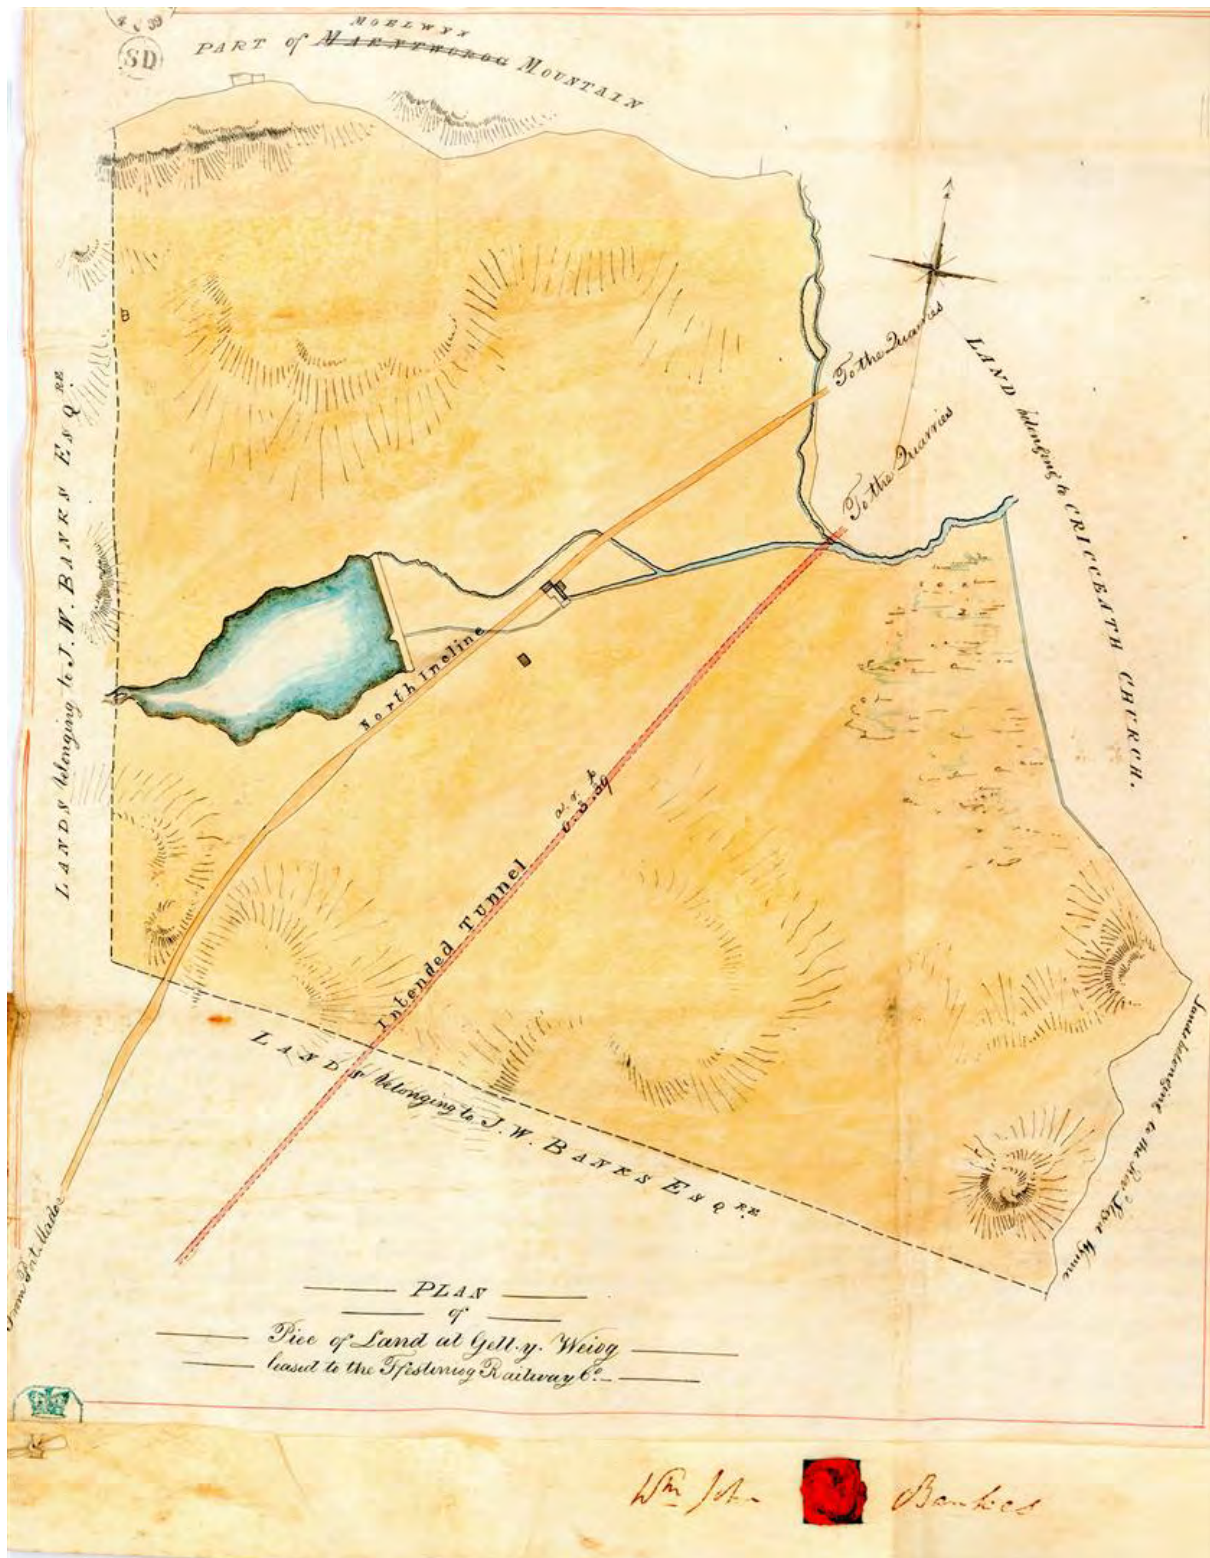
Plan of FR Moelwyn inclines. The plan demonstrates the 'Stephenson' style way of getting a railway over a col and the tunnel that replaced it.
